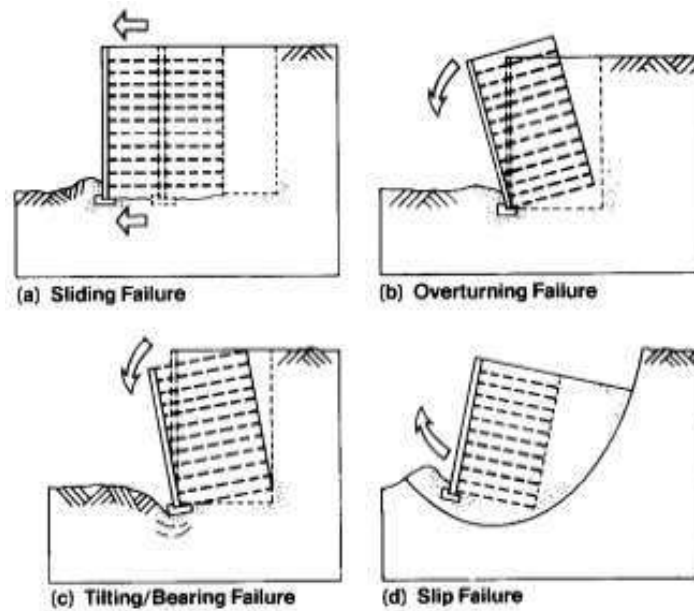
Stability of soil wall that have been reinforced[7]
